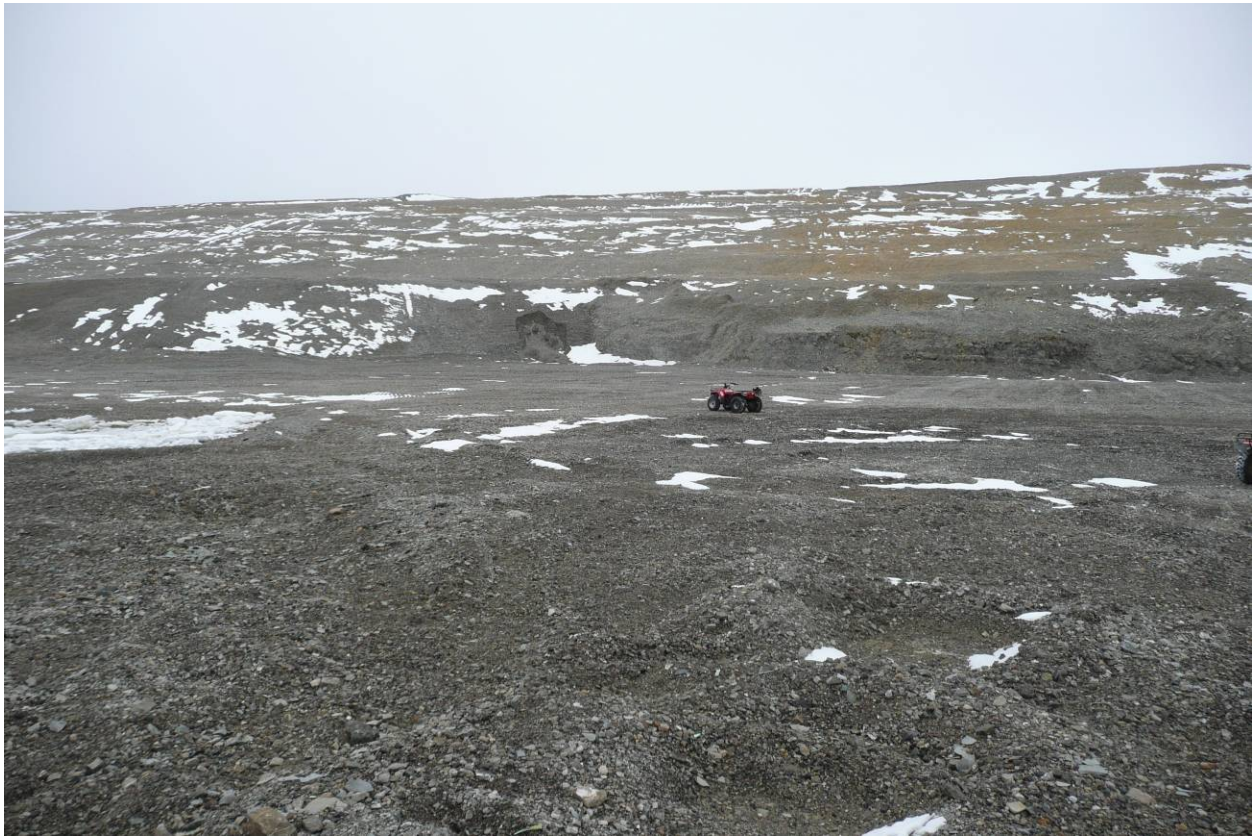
Northing 558779 Easting 8369106 Elevation 9 m
